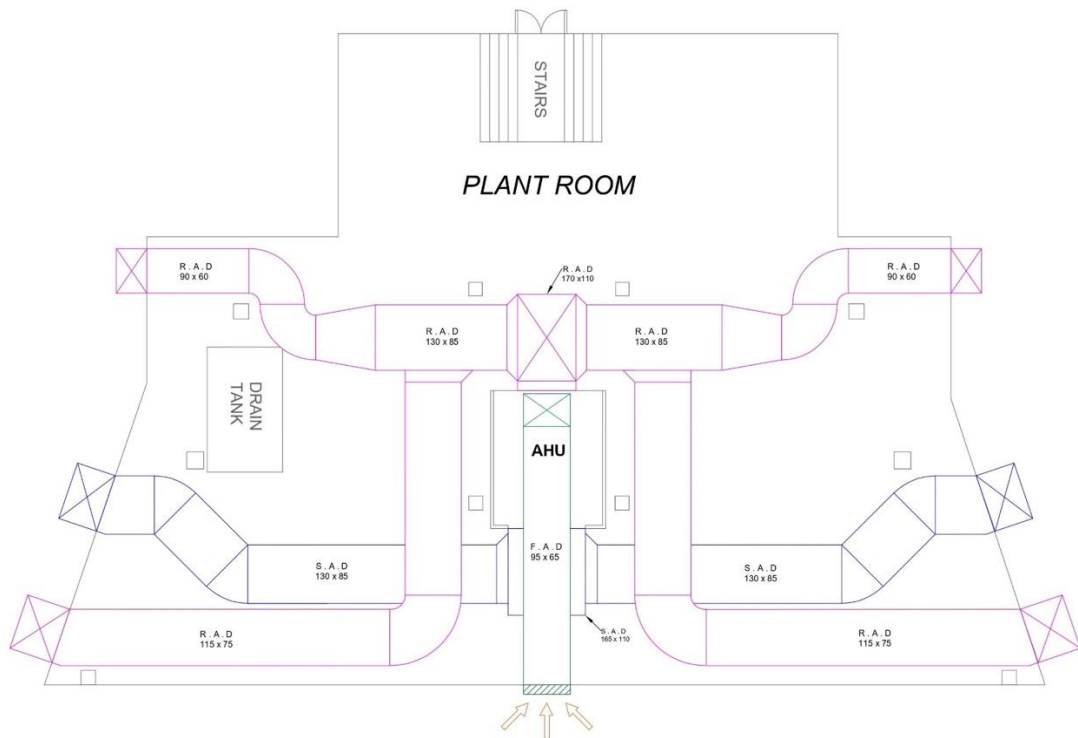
Figure XXI.- Duct Layout of Plant Room for Proposed Systems # 1 & 2
